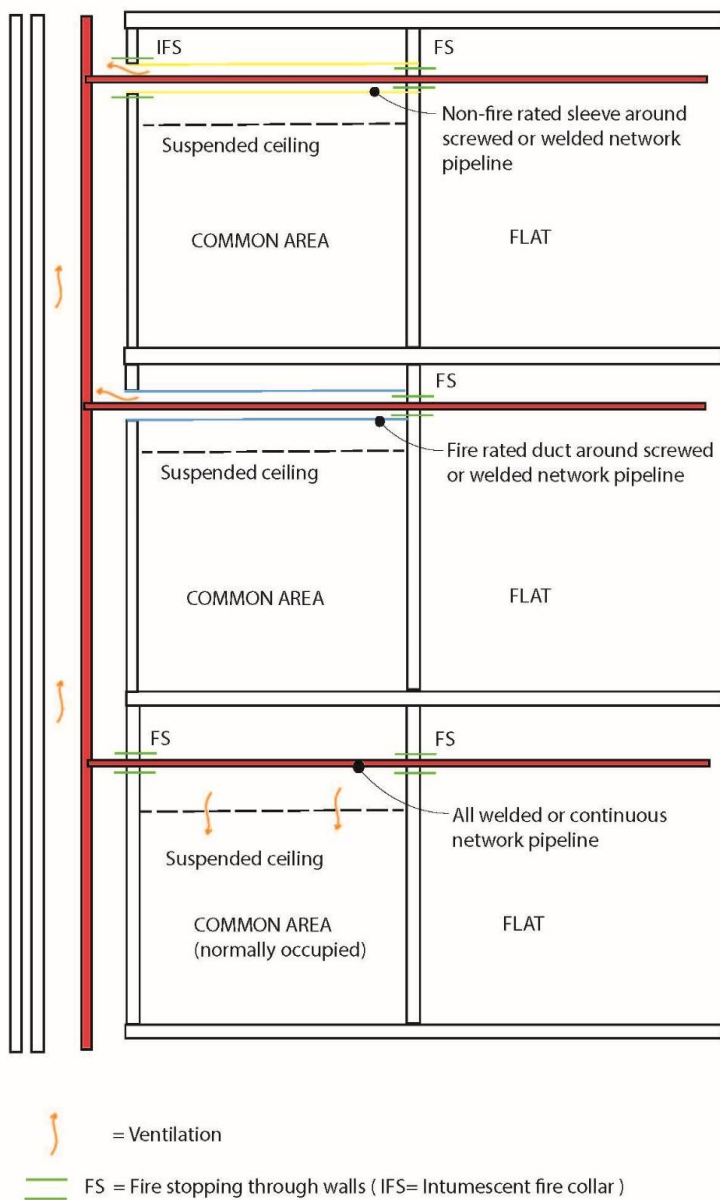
INTERNAL SCREWED OR WELDED NETWORK PIPELINE. PASSING THROUGH A PROTECTED SHAFT (ON AN OUTSIDE WALL). VENTILATED DIRECTLY TO OUTSIDE AIR
